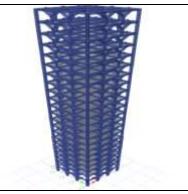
Rendered View of Model 1: G+20 Storied RC Structure with Y-shaped Columns
